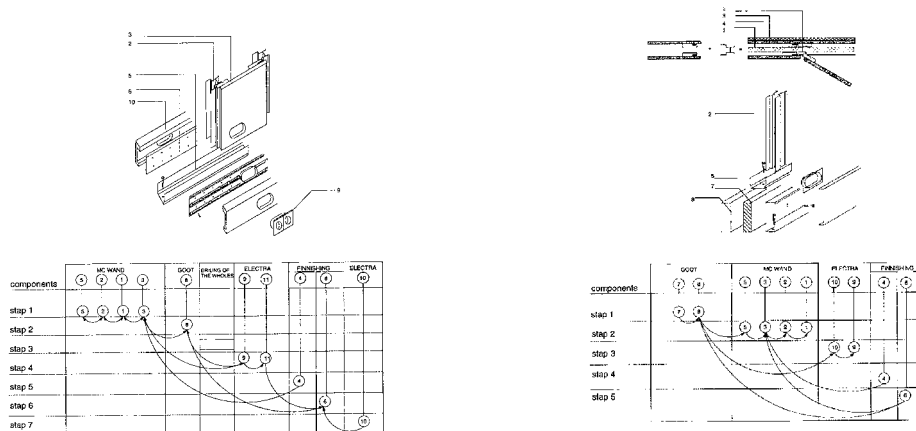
Two proposals and their assembly sequences, left (on wall duct) (proposal 2), right (under wall duct) (proposal 1)
